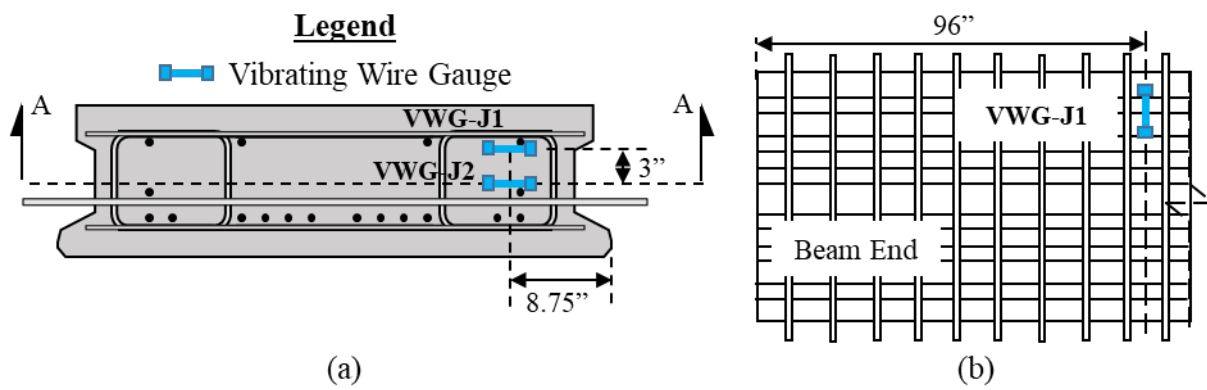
VWG locations at beam end: (a) cross section and (b) cut A-A near beam end
